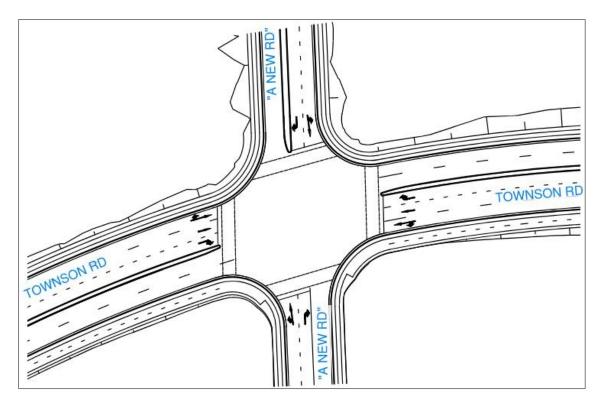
Plan view of the new intersection – ultimate phase layout
